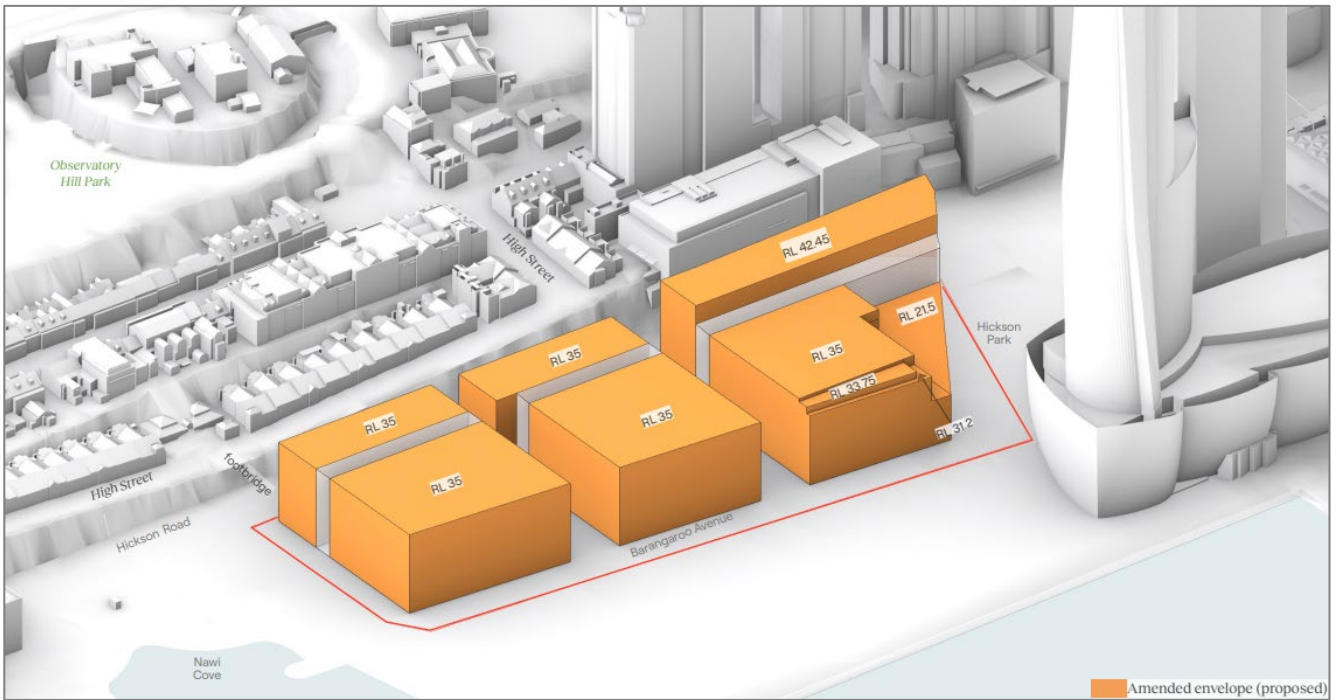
AMENDED CONCEPT BUILDING ENVELOPE AXONOMETRIC (SJB)
